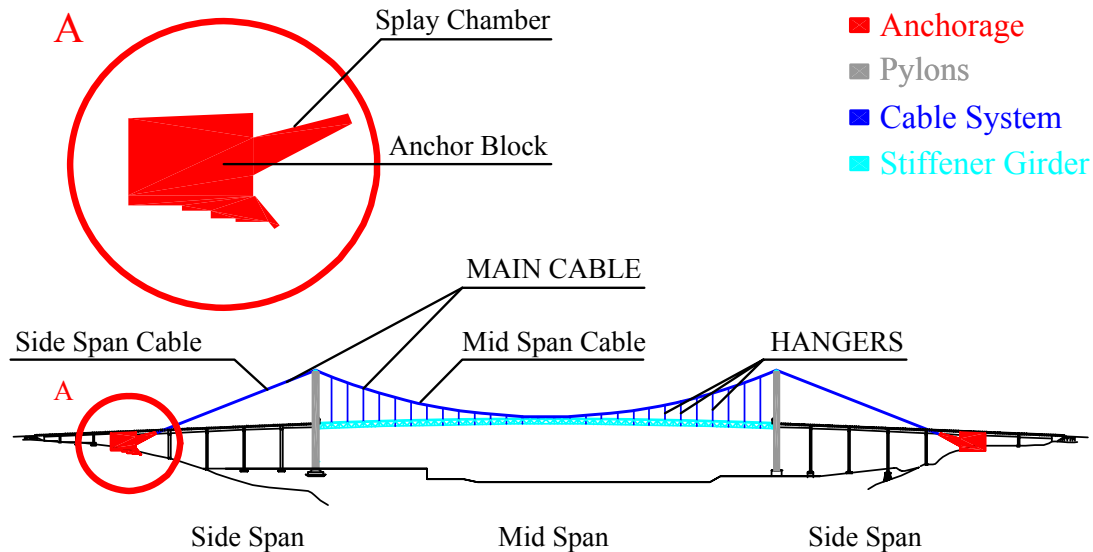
3 Structure of the Älvsborg Bridge. Picture modified from AutoCAD drawing by Ramböll.
